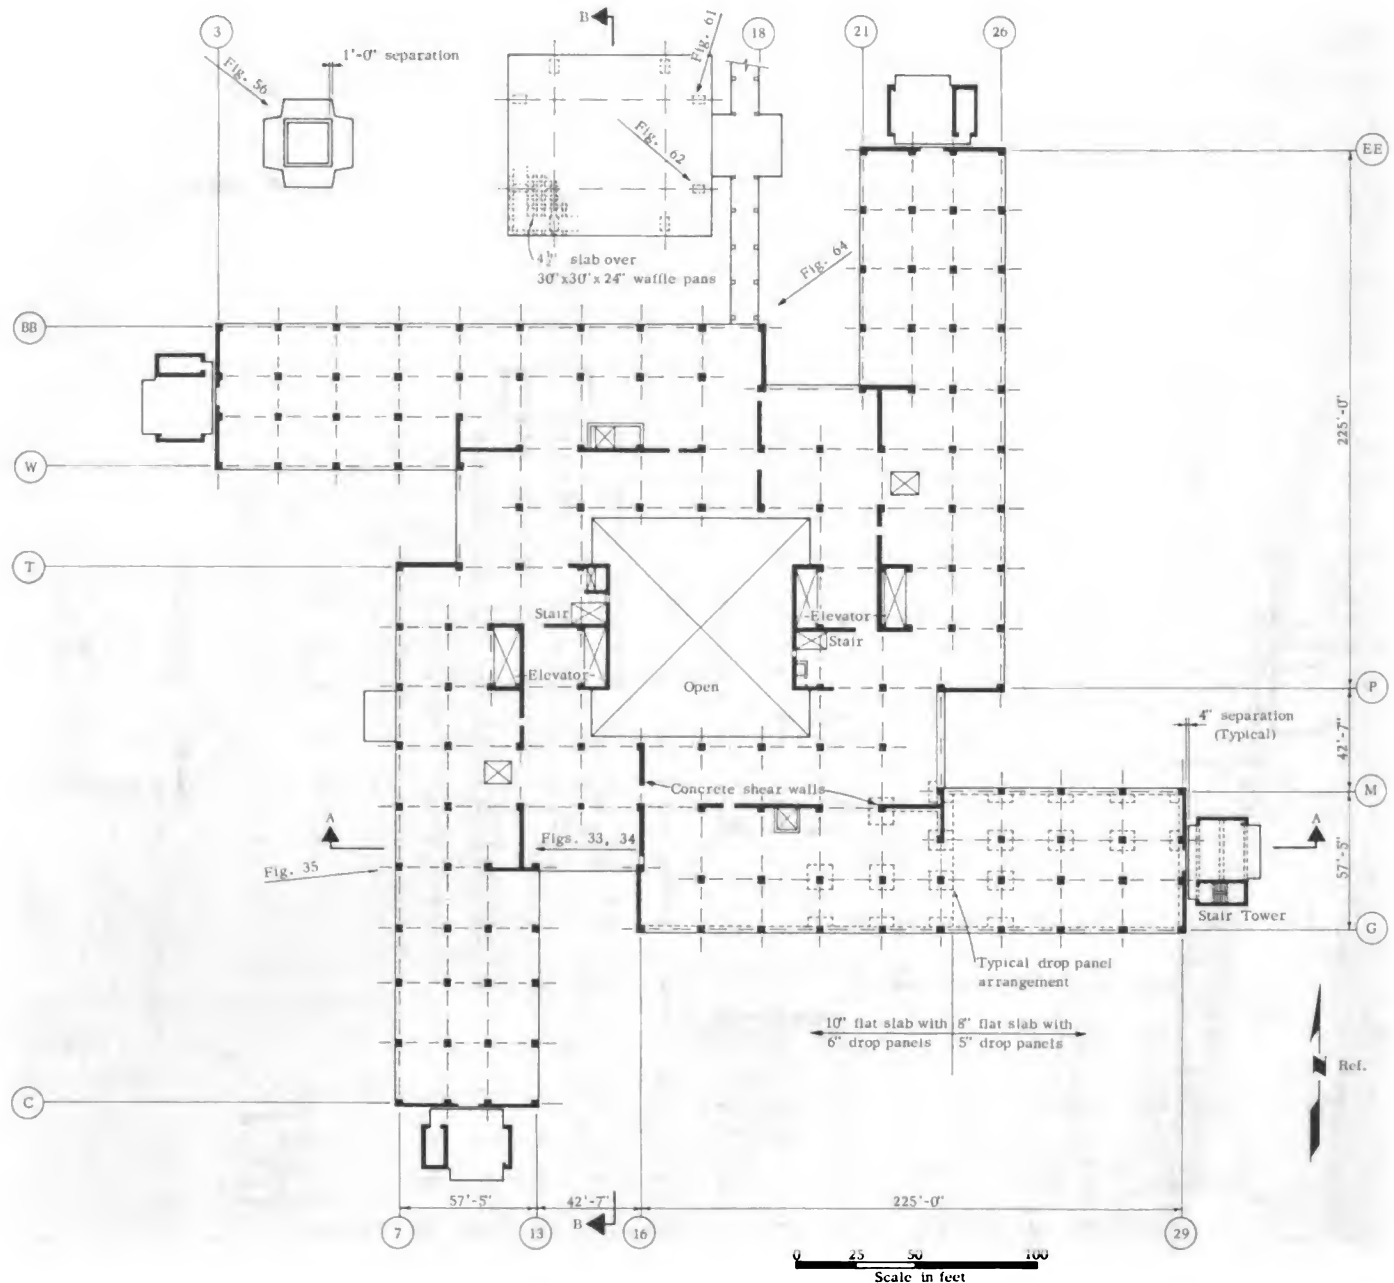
Olive View Hospital, medical treatment and care unit. Second-floor framing plan. Third, fourth, and fifth floors are similar.
